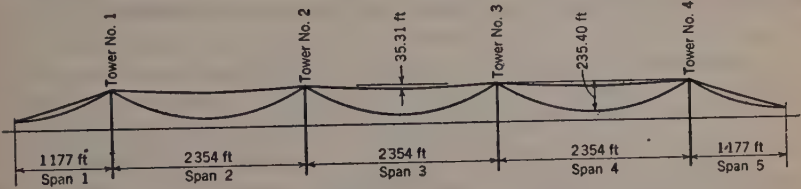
GENERAL DIMENSIONS, MULTIPLE-SPAN SUSPENSION BRIDGE.
